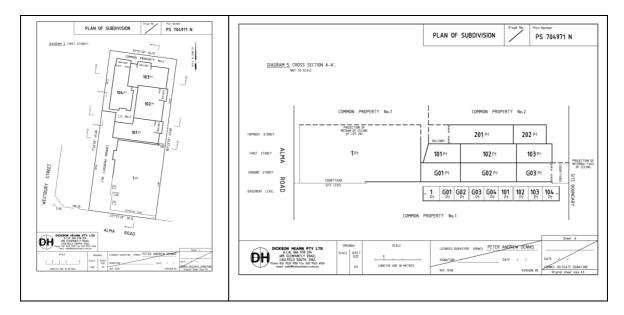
A building subdivision plan in Victoria including floor plans and cross-sections
